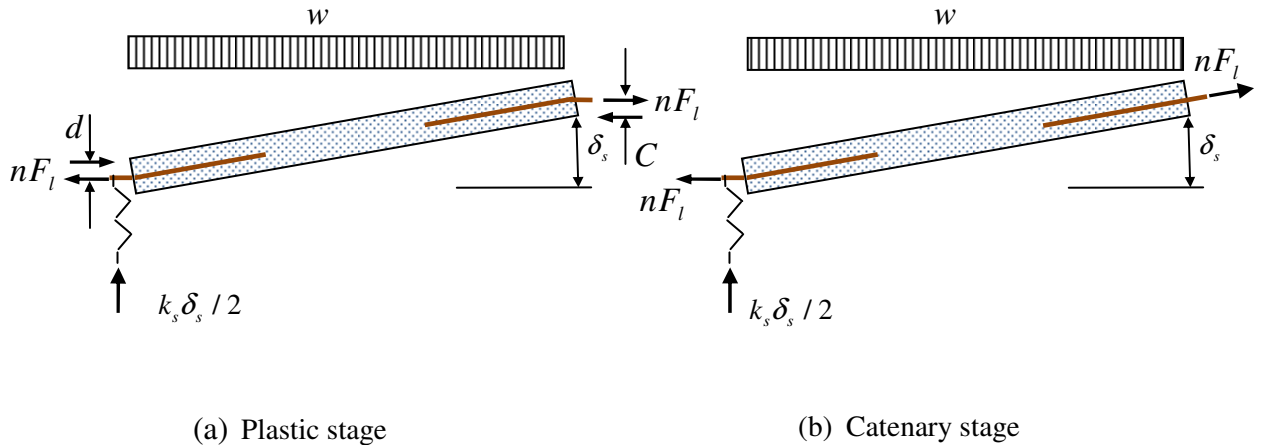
Floor-to-floor joint facilitated by longitudinal ties and transverse ties-free body diagram of half system
